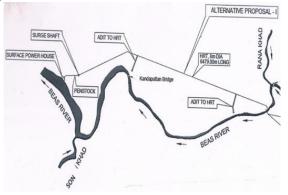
Remote Type Hydro-Electric Installation with Diversion Tunnels in River Beas (Source:HPCCL,2011)
